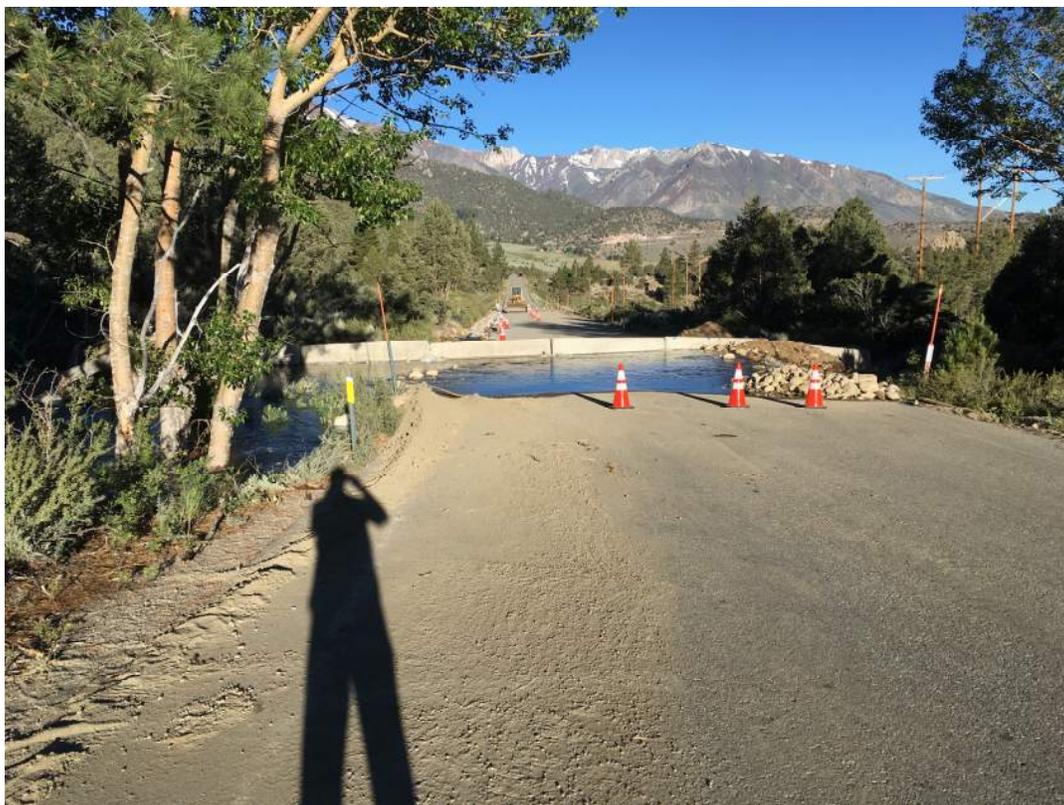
Road Closure and Temporary Diversion Over Top of Road – View West
